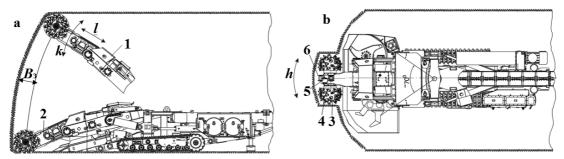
View of multipurpose roadheader operation: a – side cutting view; b – top view after cutting
